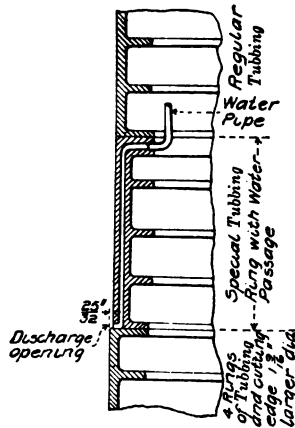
Construction of Sinking Drum for Hydraulic Flushing Process
